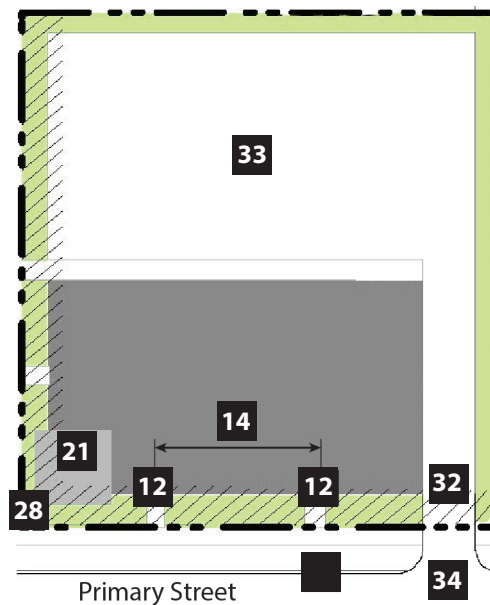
General building siting diagram shown with corner tower and rear vehicular access. Not to scale.
